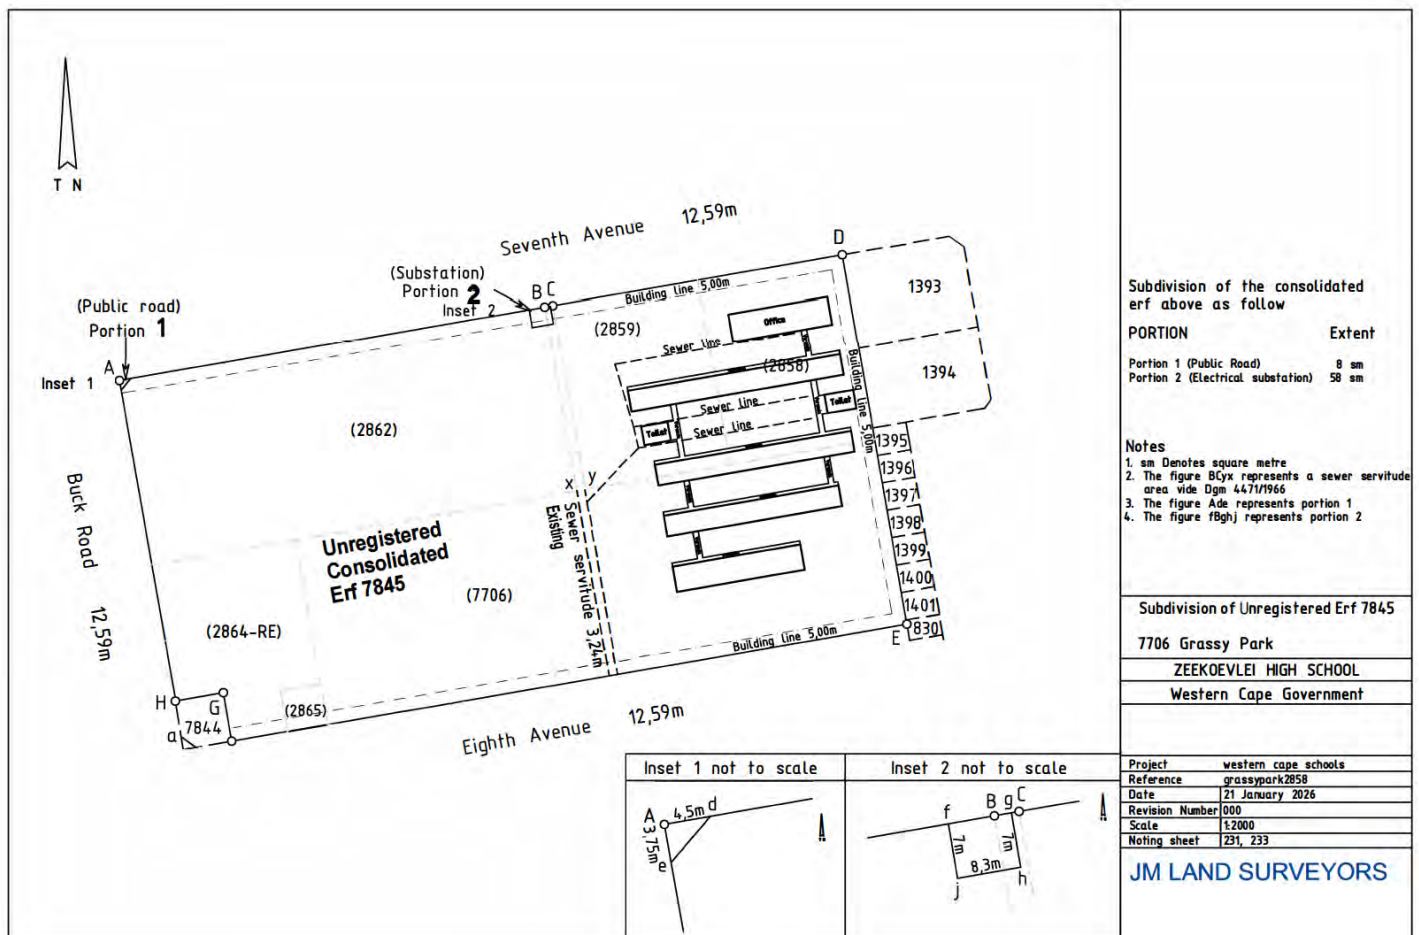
EXISTING SWEWER SERVITUDE LOCATED ON ERF 7706 ALONG WITH AN EXISTING SUBSTATION LOCATED ON ERF 2862 AND THE EXISTING ROAD SPLAY LOCATED ON THE TOP LEFT CORNER OF ERF 2862.
